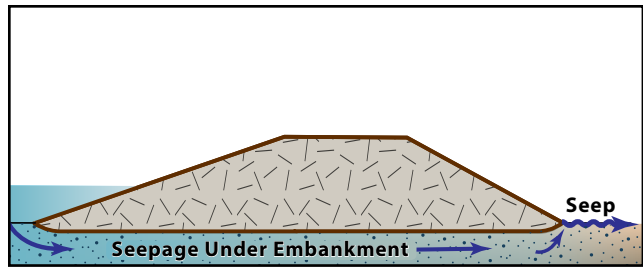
Typical Embankment Section Showing Seepage with Wet Conditions Downstream
